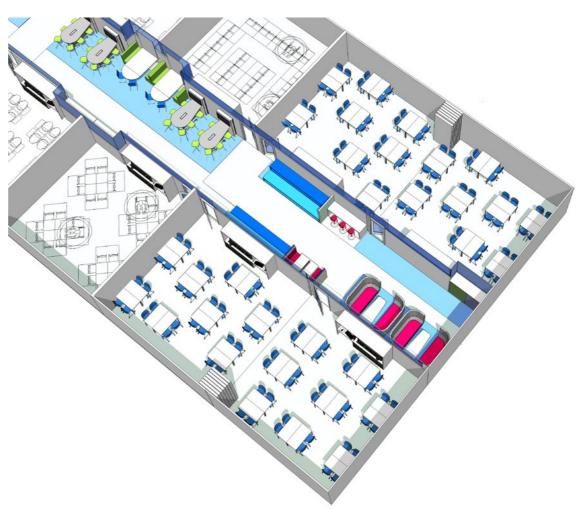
Dual teaching space (2 No. Type B Classrooms)
